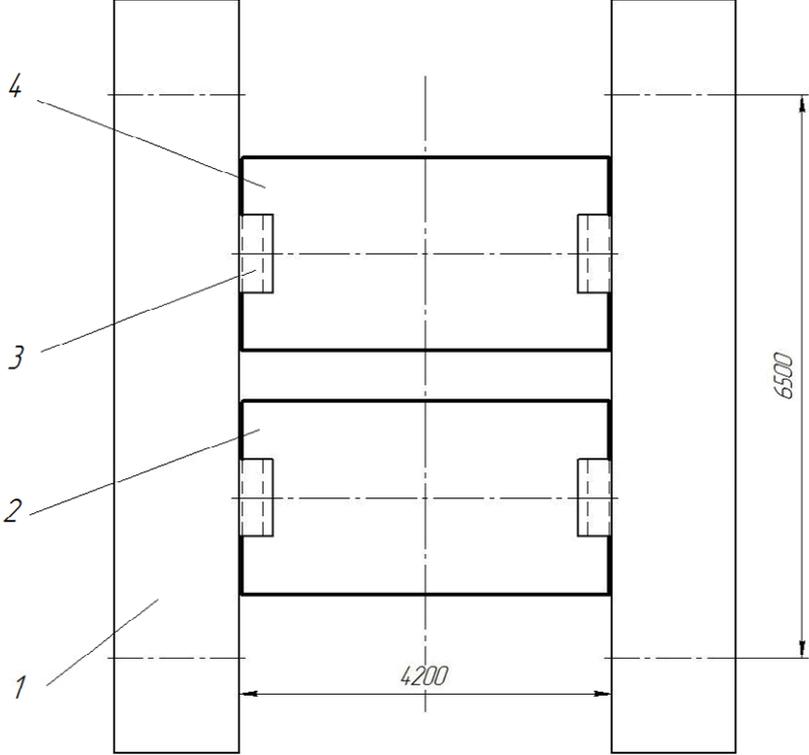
The location of the supporting structure under the excavator (indicated by a thickened line): 1 – crawler tape; 2, 4 – fragments of the supporting structure; 3 – the main platforms of the traverse of the excavator
